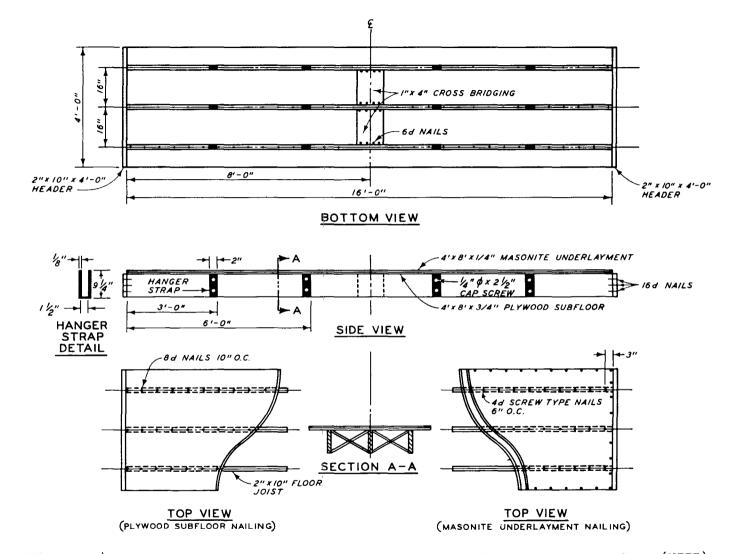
Construction drawing for the hanger strap reinforced test specimen (VIII).
